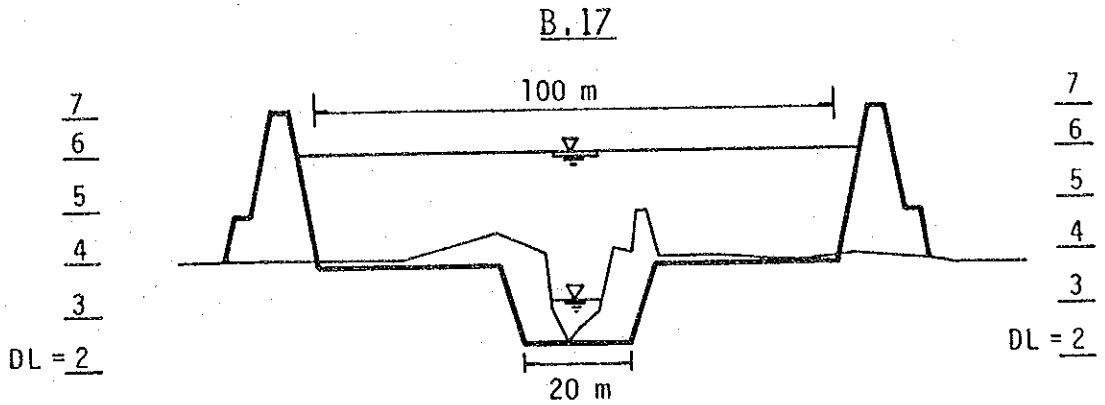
Proposed Long-Term Plan of Asahan and Silau Rivers (1/6)
